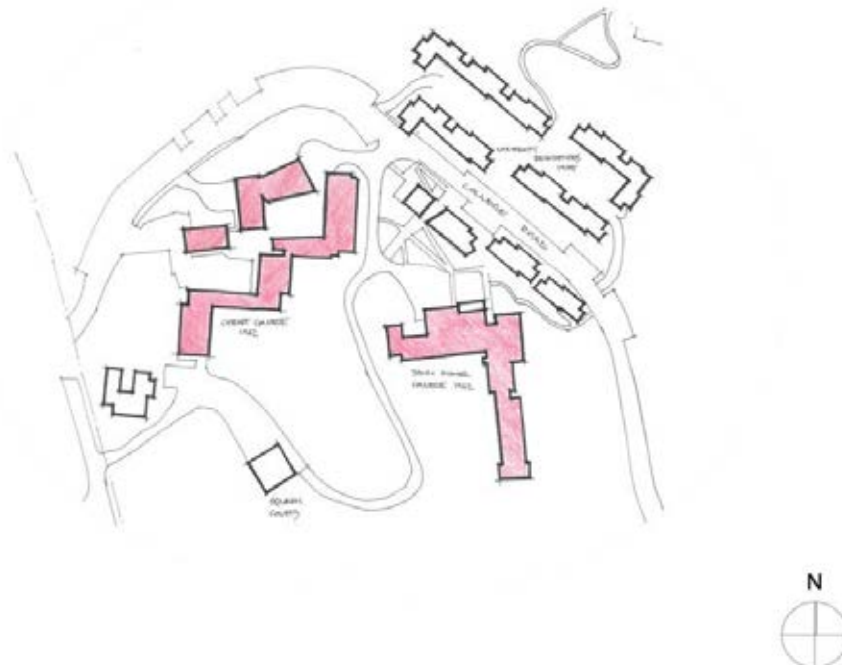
Site Plan Section 5 marking the buildings constructed to 1965 overlaid on current campus layout. Source: Paul Davies Pty Ltd
